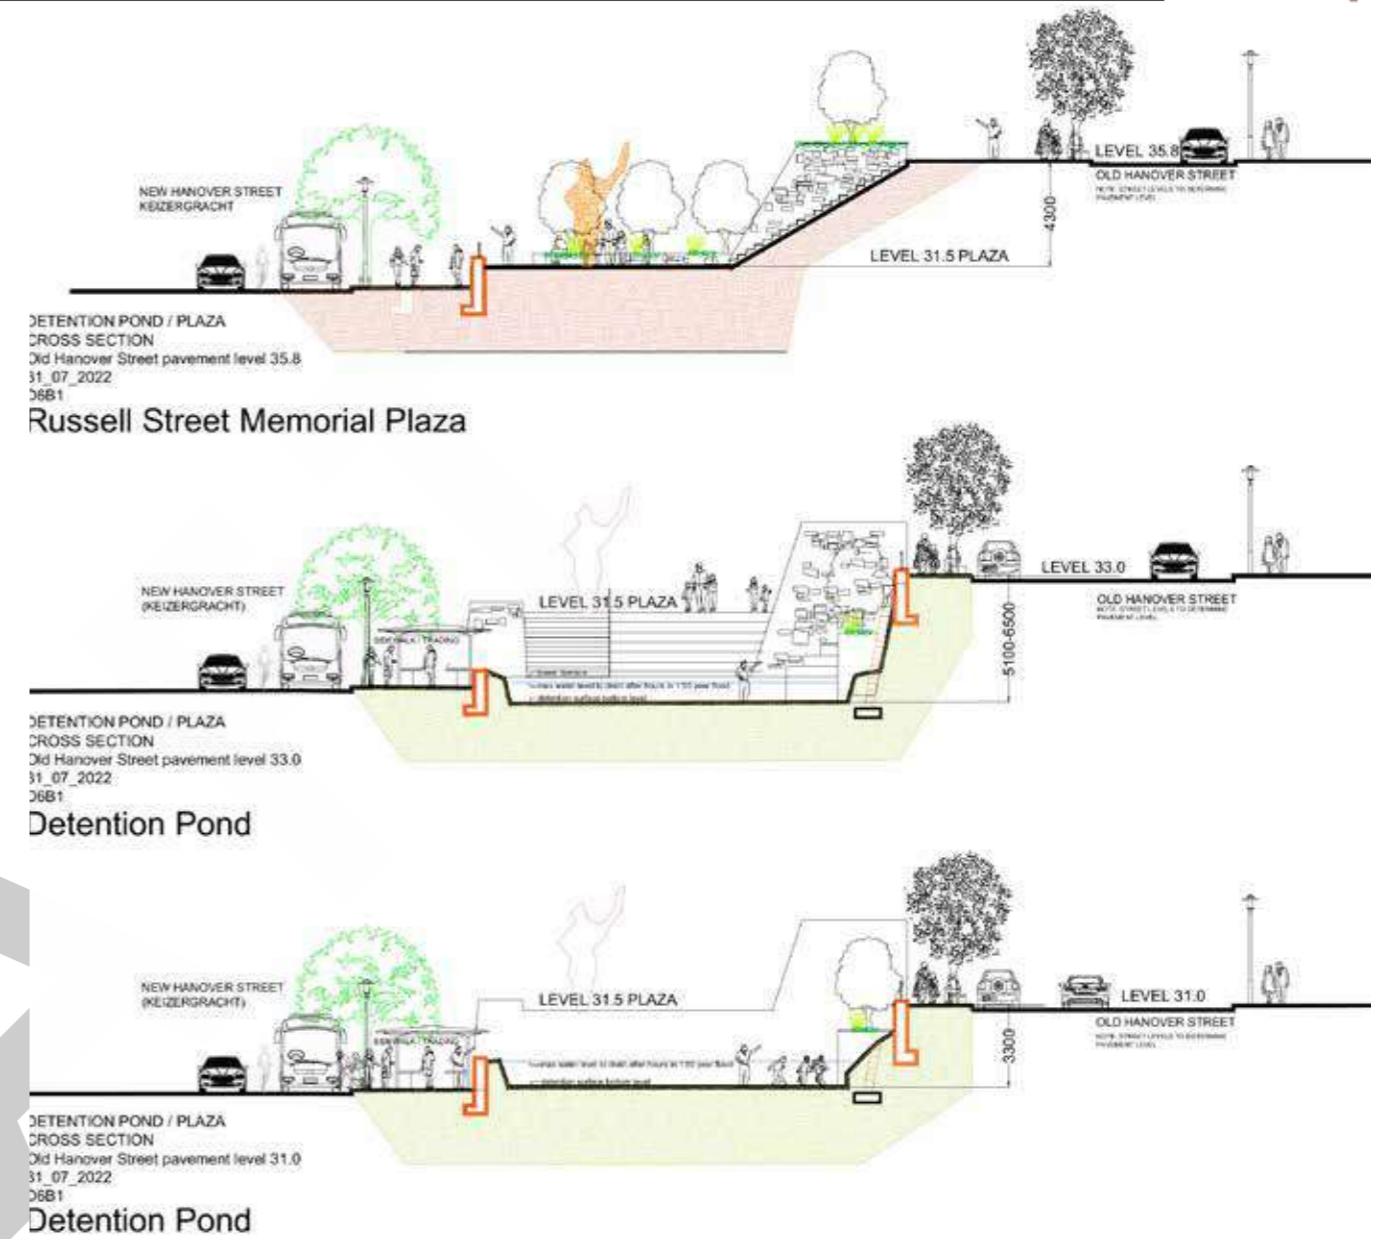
Plan and section of the proposed detention pond, designed as a shallow, level area that can be used as a kickabout and/or multi-function public open space, with the land east of Russell Street Plaza retained for future development (D6-ADE-JV, 2022)
